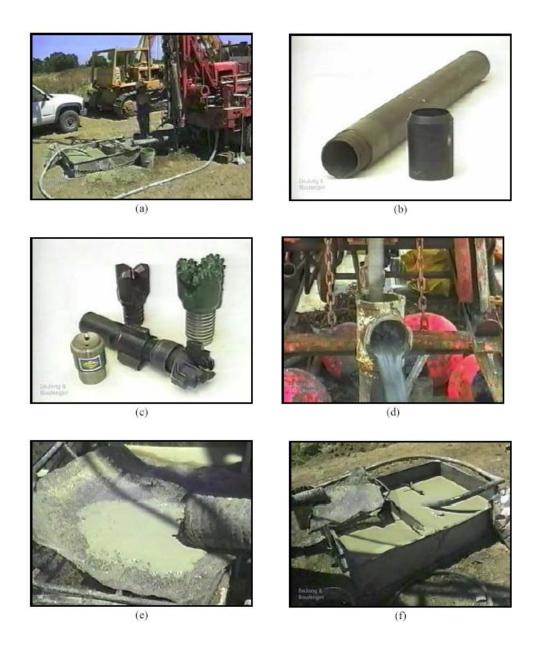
Rotary Wash Drilling System: (a) Typical drilling configuration; (b) Casing and driving shoe; (c) Diamond, drag, and roller bits; (d) Drill fluid discharge; (e) Fluid cuttings catch screen; (f) Settling basin (mud tank).
